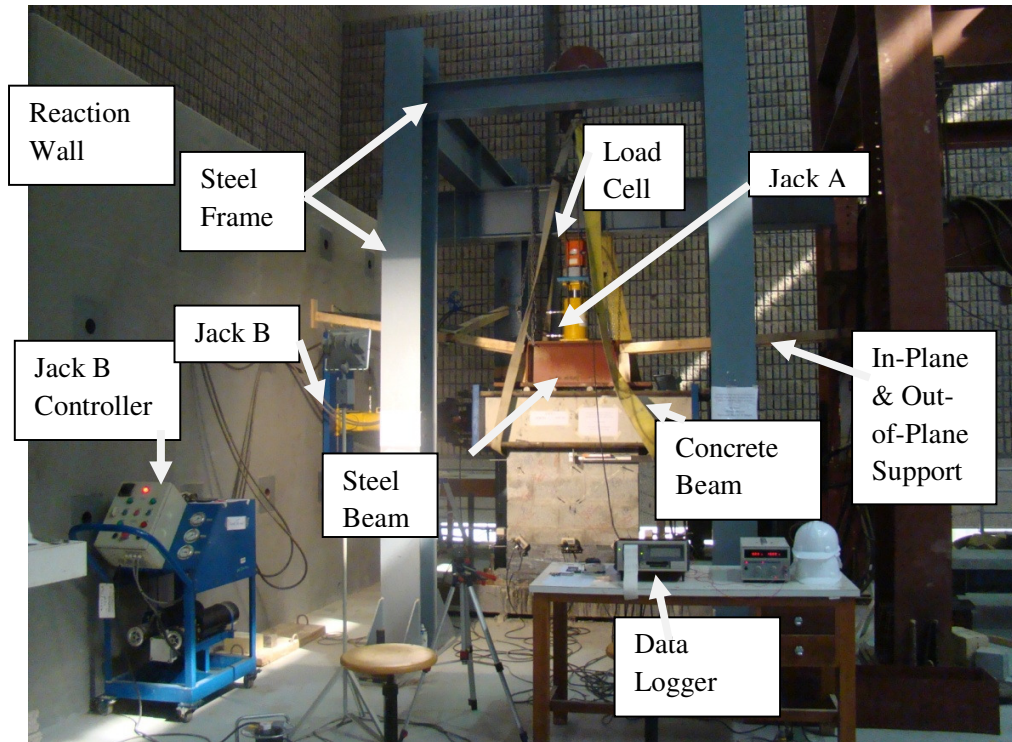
Cyclic Test Setup for NCMW Wall
